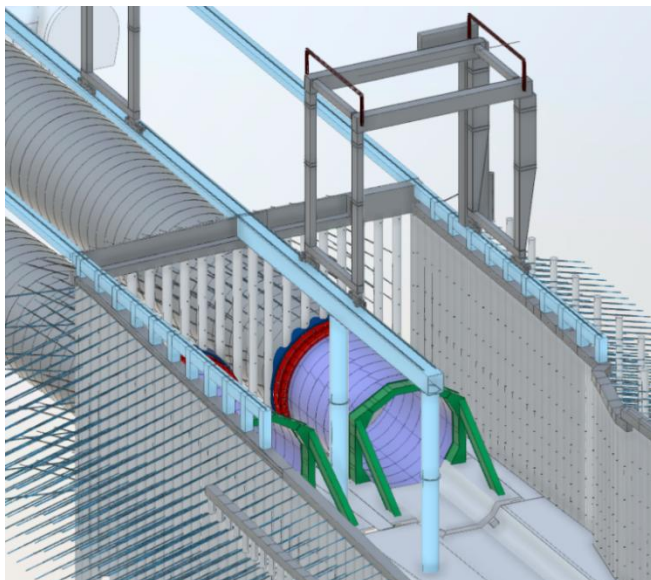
TBM assembly gantry crane original concept with central beam supported on columns
